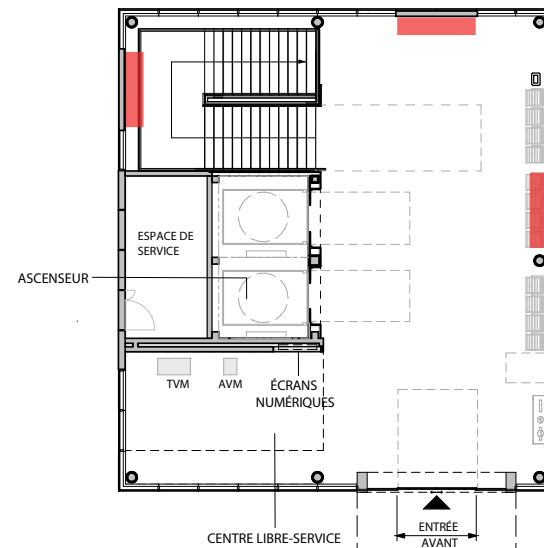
(above): Platform Access Module plan when joined to Station Ambassador Module
